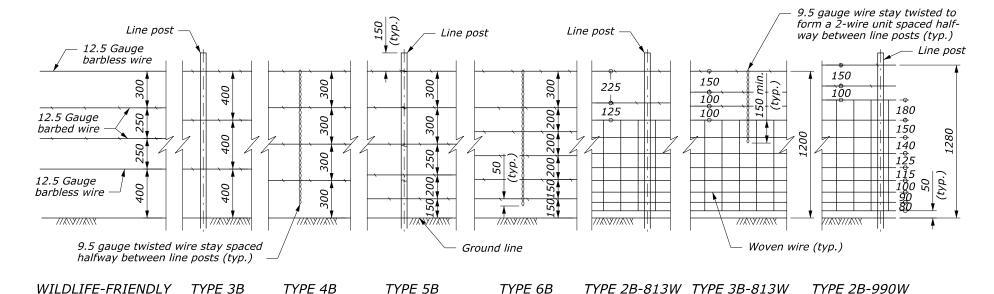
DETAIL APPROVED FOR USE 2/2010 DETAIL W619-60
